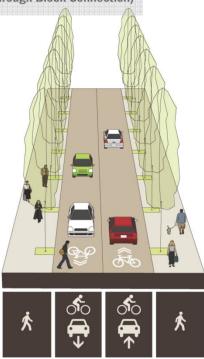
Narrow Street 1 (Through Block Connection)
